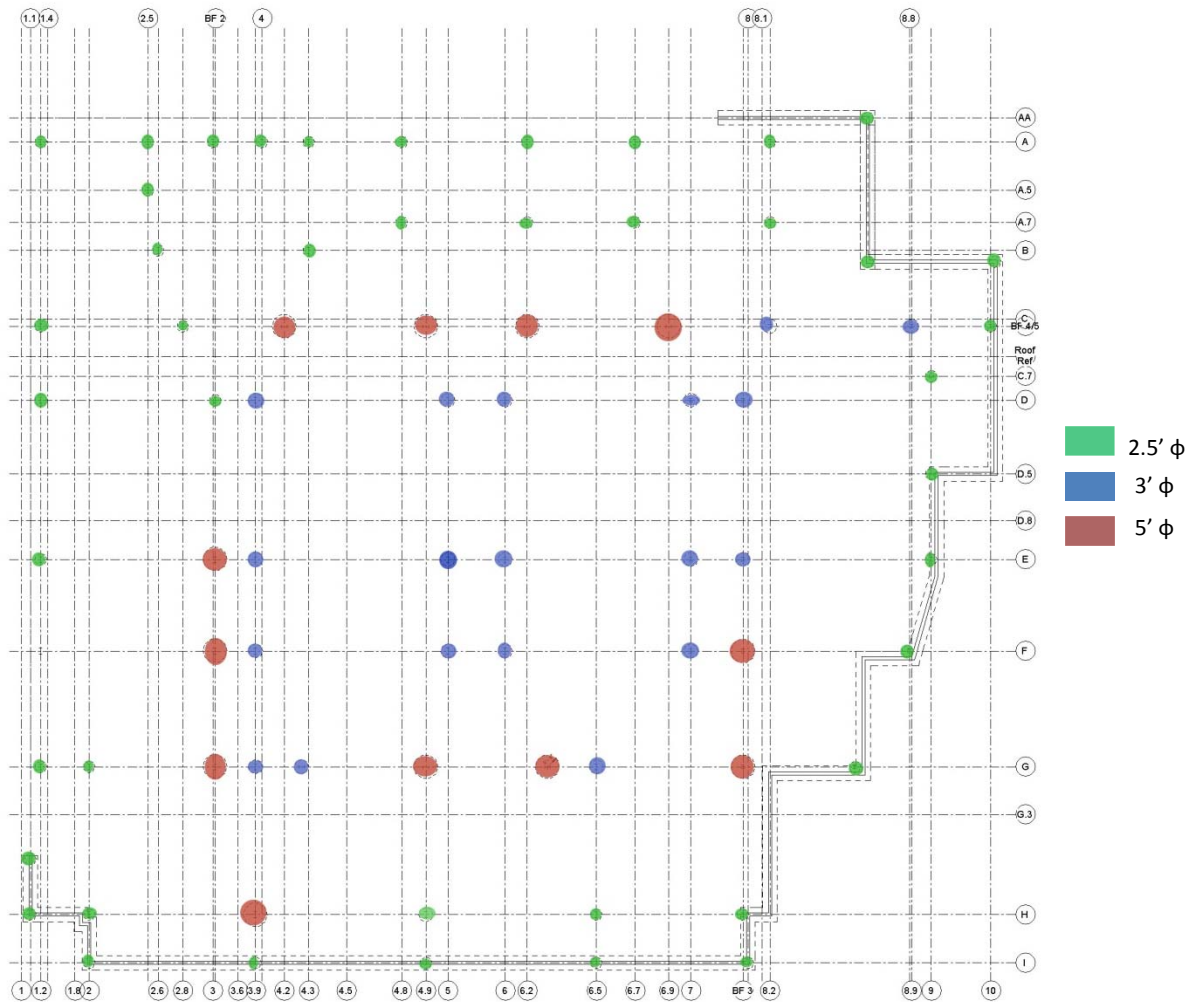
Core Drilled Pier Sizes and Locations
